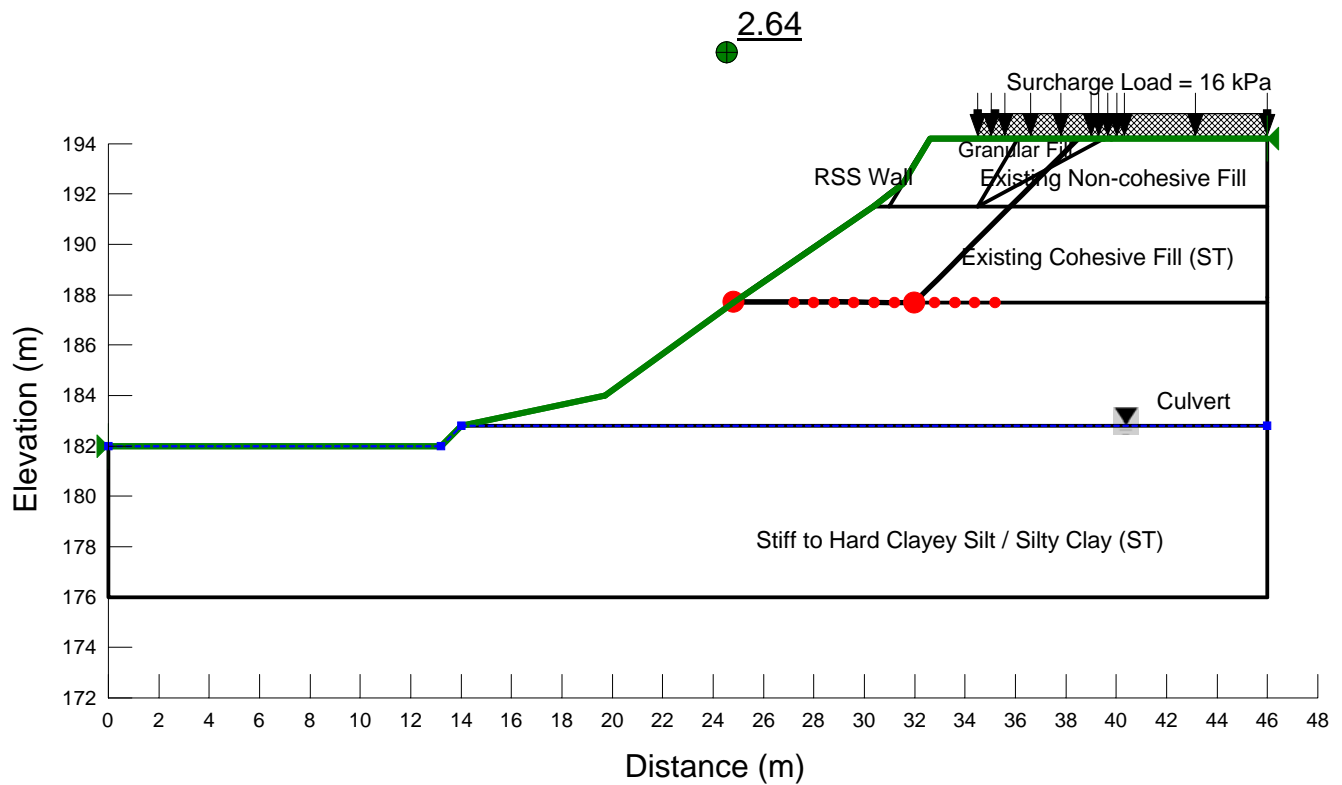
Slope Stability Analysis including Proposed RSS Wall - Sta. 15+205
